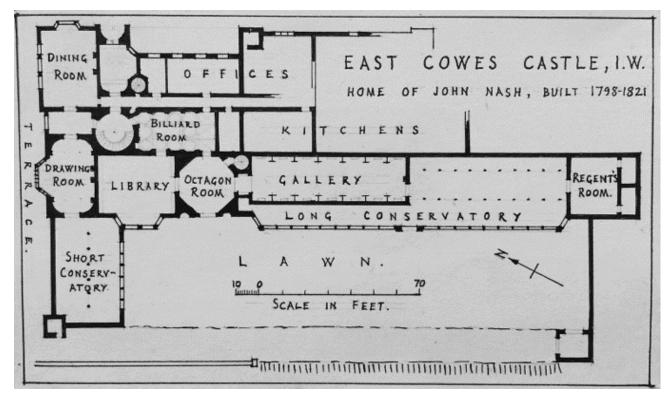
(above): A plan of East Cowes Castle showing the layout of the principal ground floor rooms.
